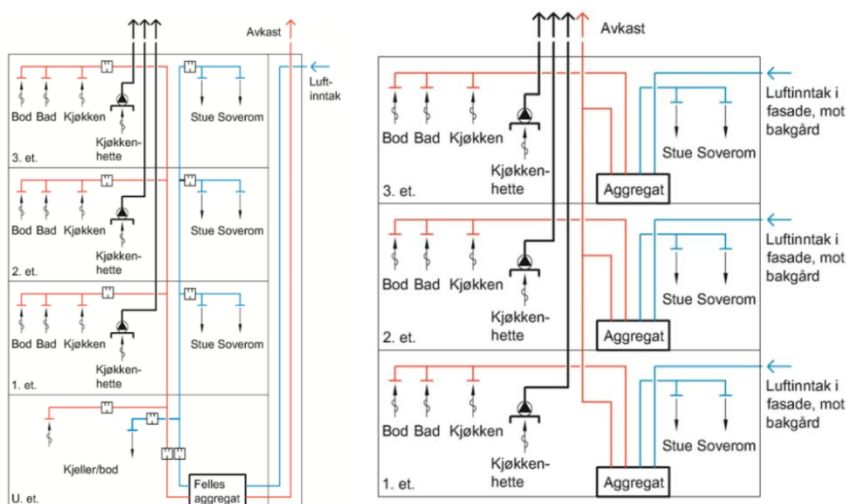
Principle sketch of apartment building with balanced ventilation. [3]
